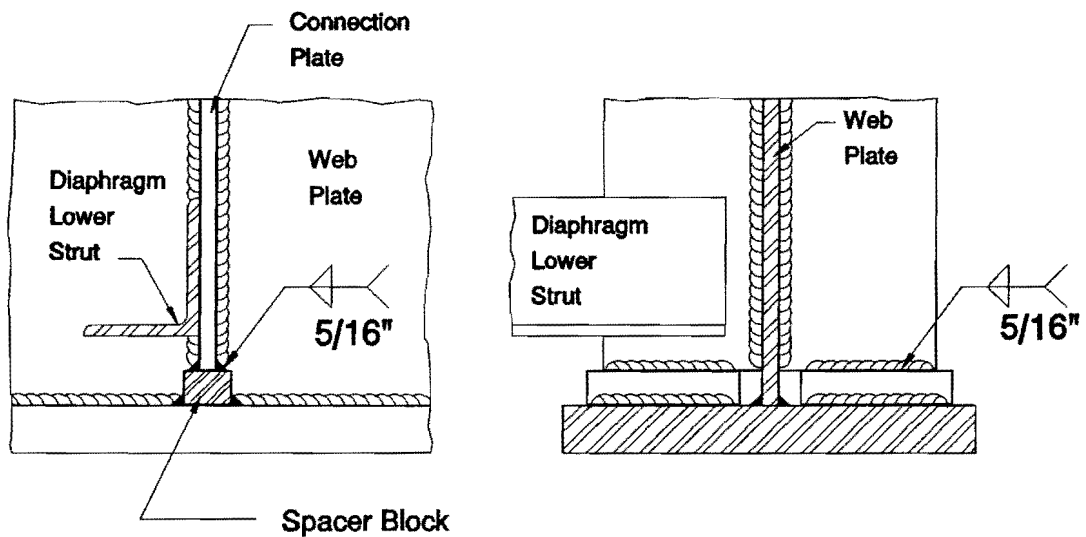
Recommended welded attachment for cut-short connection detail.
